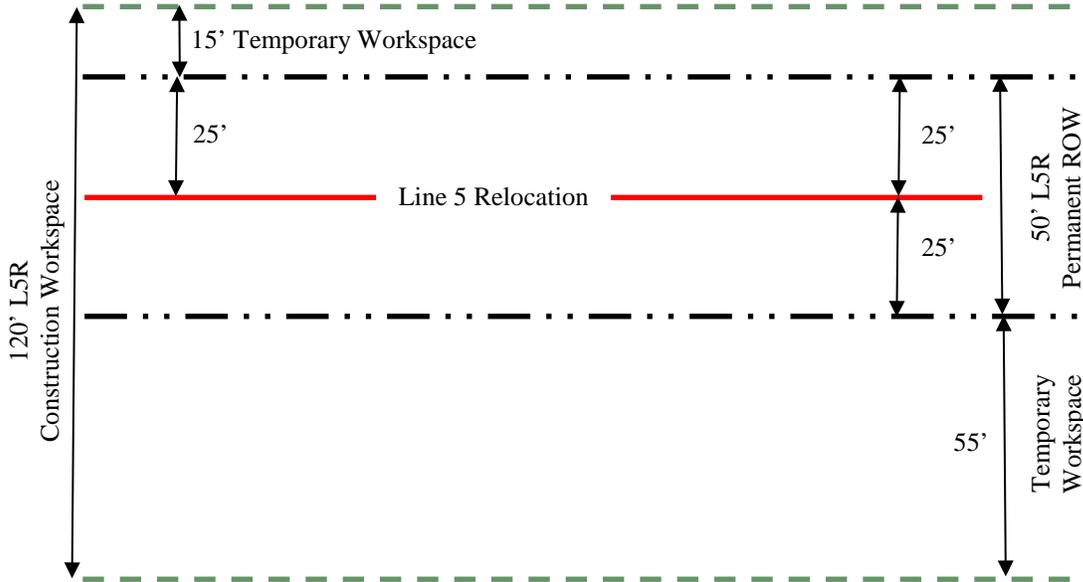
Typical Construction Workspace—Uplands
